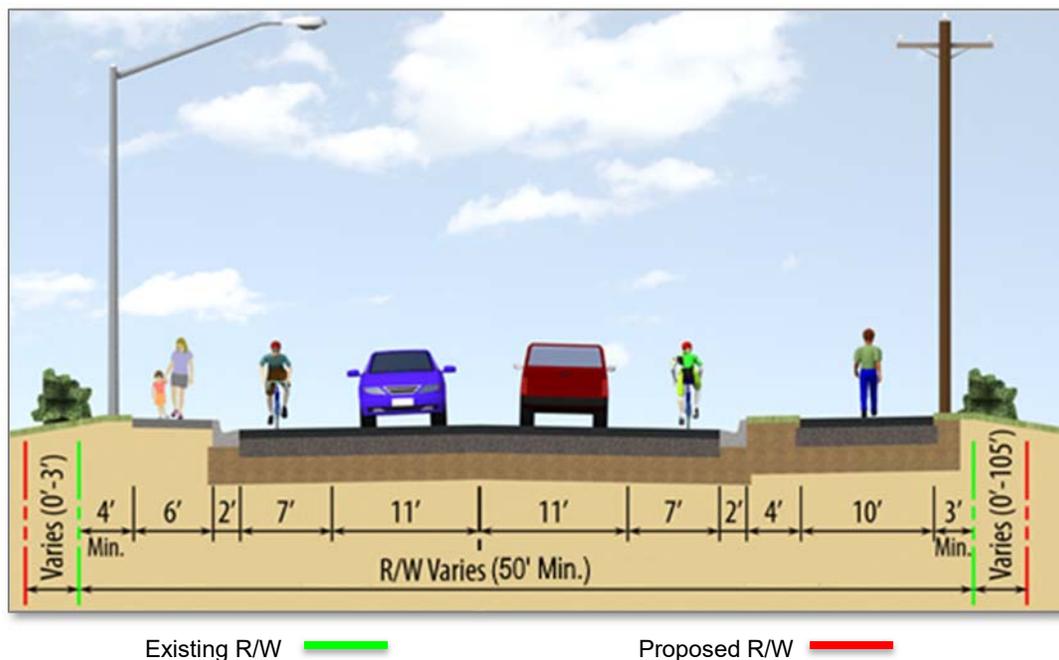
BUILD ALTERNATIVE 1 - ROADWAY TYPICAL SECTION
